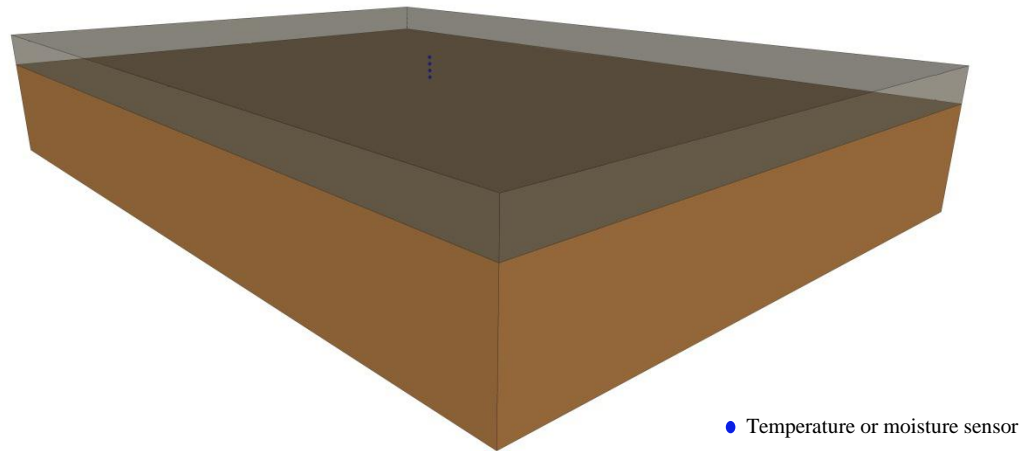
Typical PCC pavement environmental-condition-monitoring sensors installation layout.
